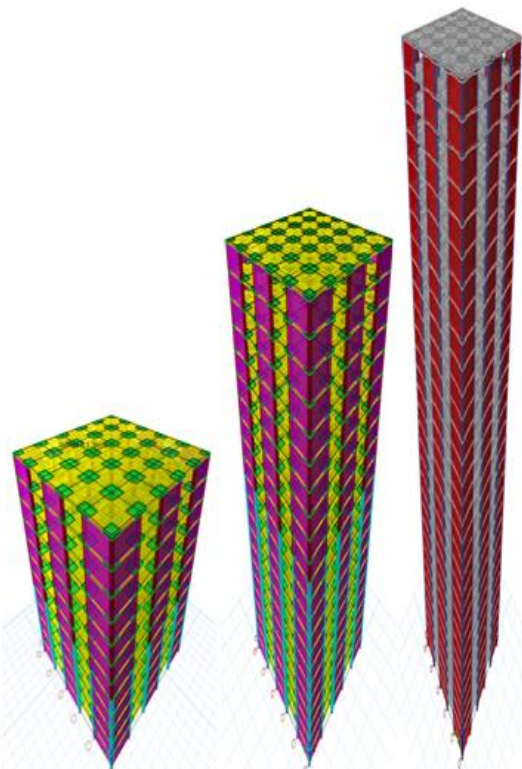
ISOMETRIC VIEWS OF FLAT SLAB BUILDINGS (G+10, G+20, G+30)
